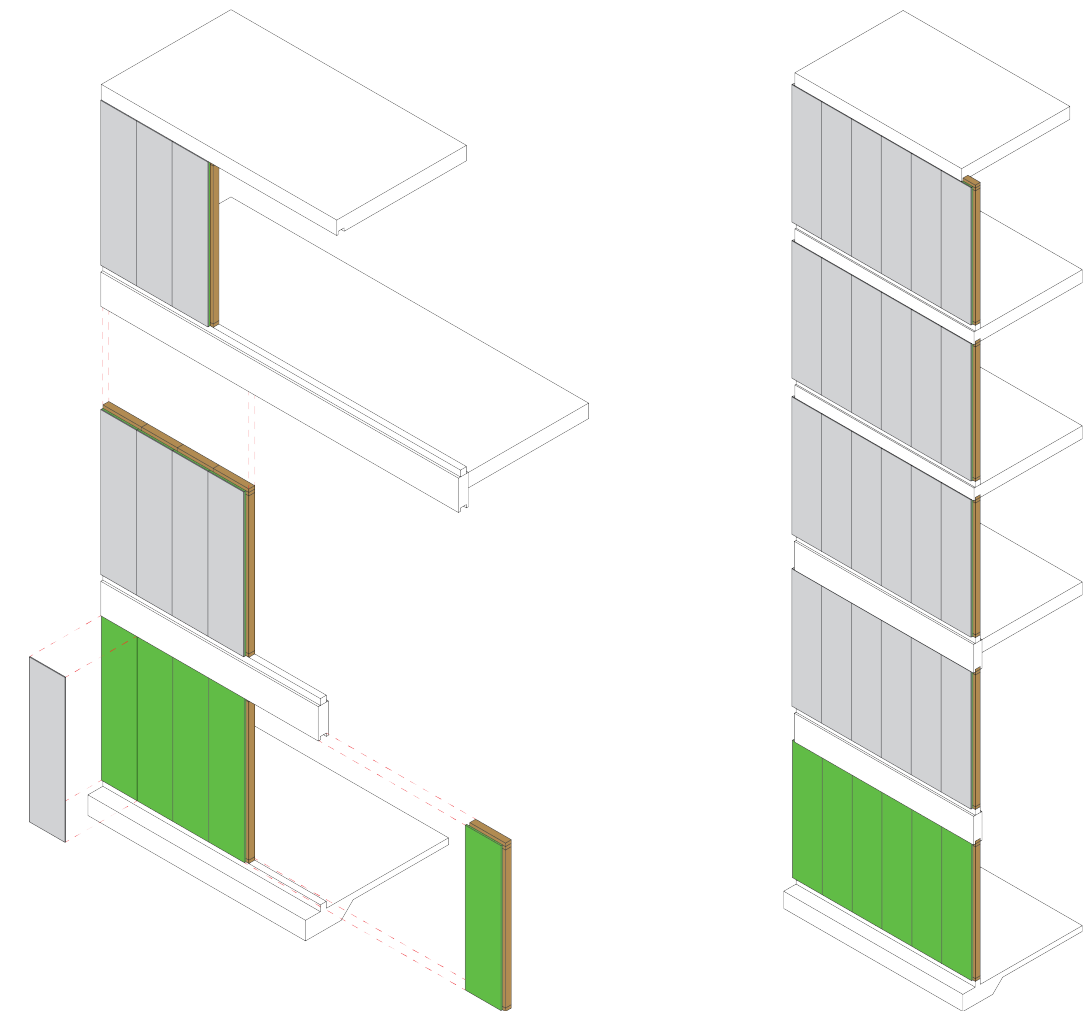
Diagram of a typical wall, exploded axonometric and assembled.
